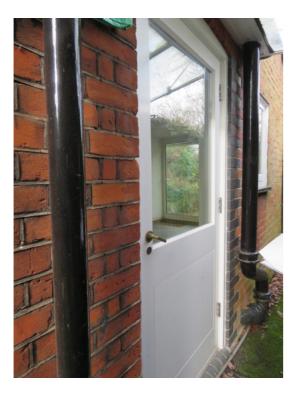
View of side of rear extension showing incongruous glazing, poor detailing and mismatched brickwork
